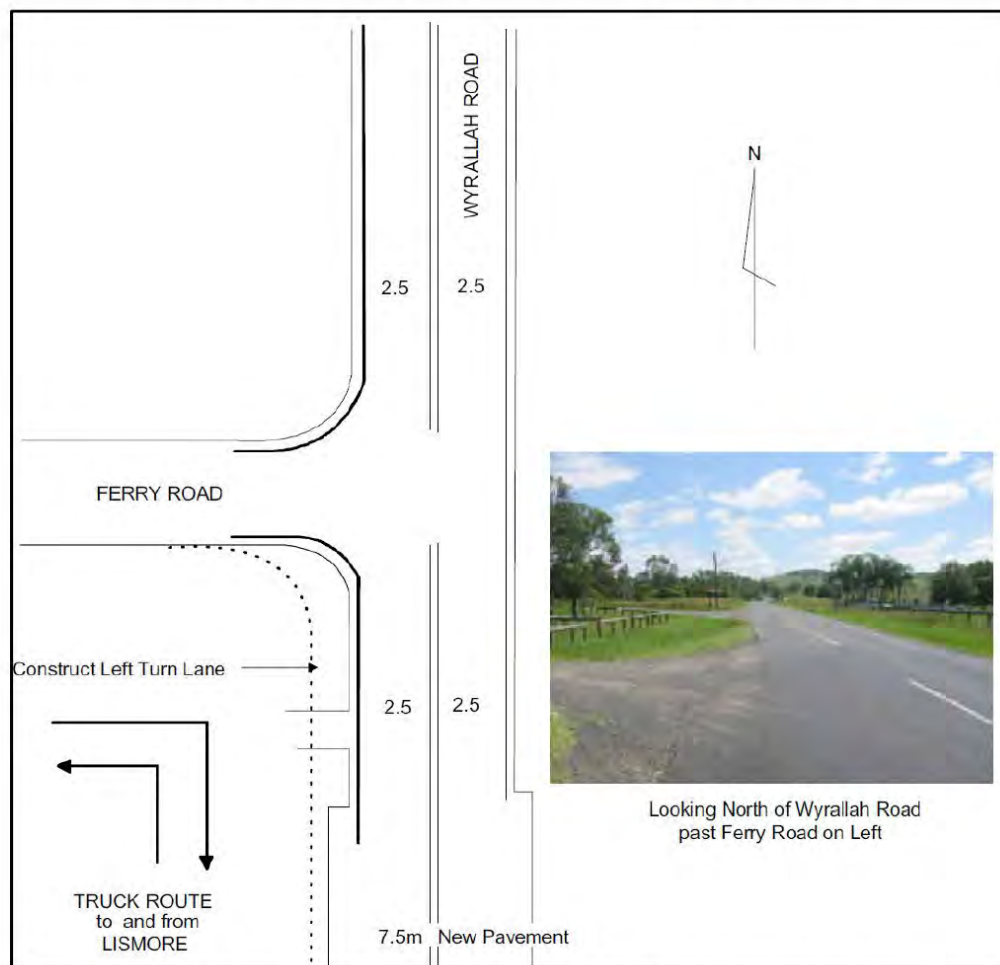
Wyrallah Road / Wyrallah Ferry Road Intersection Upgrade
